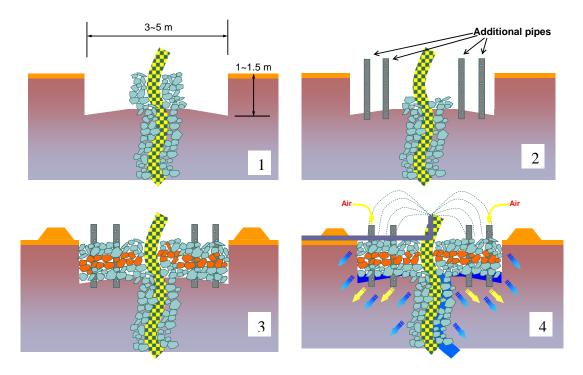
Construction of Leachate Re-circulation Facility in the Waste Layer
